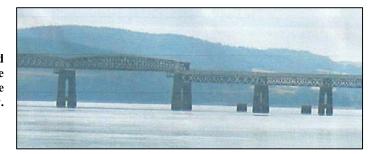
Northern segment of second Tay Bridge, showing stumps of the original bridge's piers poking above the Tay.
